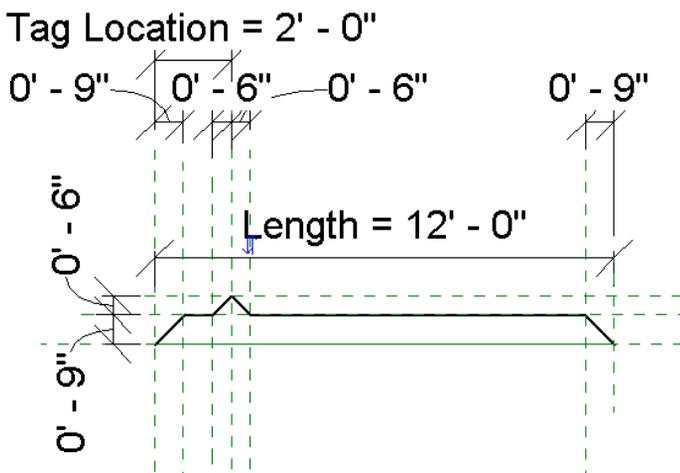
The stretchable bracket is a detail family used to show the extents of a finish in floor plan.
